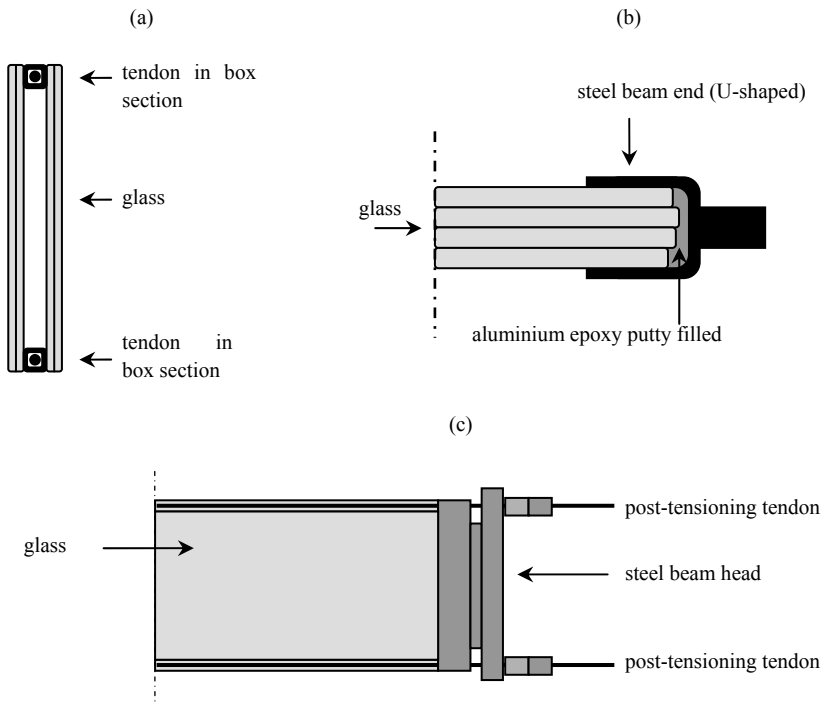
Post-tensioned hollow-section glass beam [Louter & Veer, 2007b]; (a) cross section; (b) top view beam end; (c) side view of beam end.
